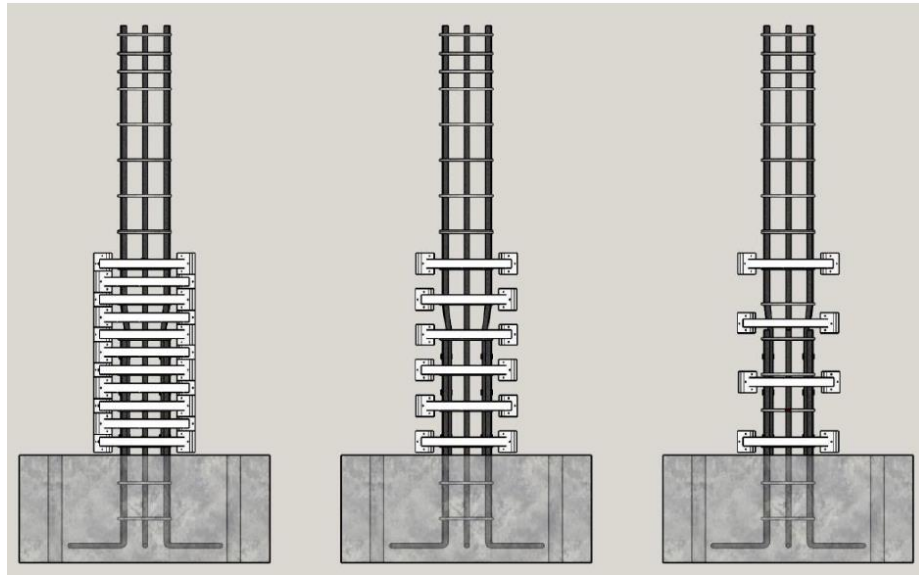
Different HSS collar arrangements to strengthen substandard lap splices by Kruavit [76].
